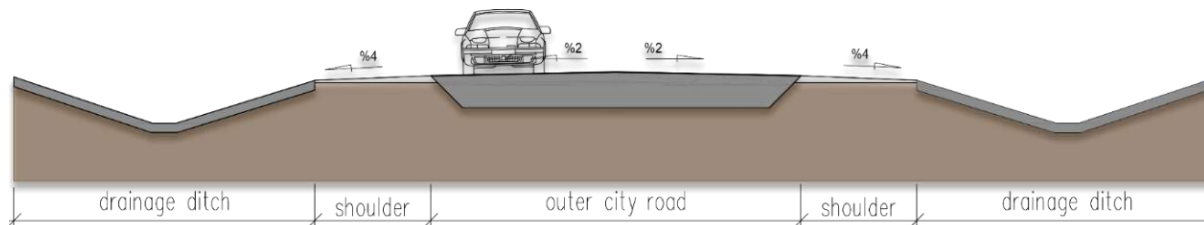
Cross section of a suburban type road (Yamata, 2002-2007).
